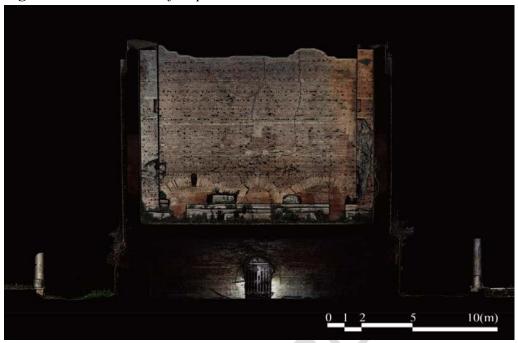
Tilted Wall next to House of Jupiter and Ganymede
